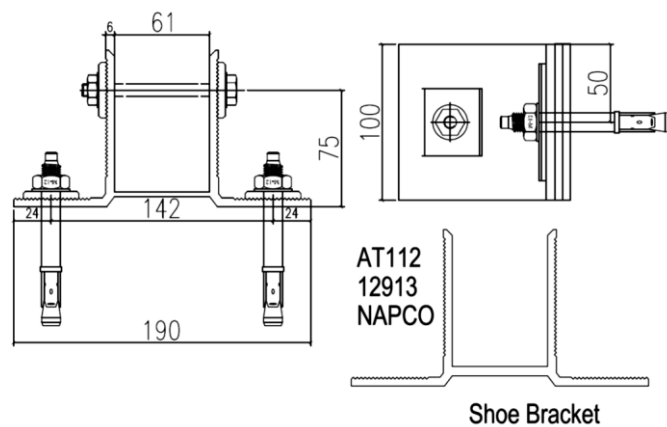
Technical drawing of a fabricated aluminum shoe bracket showing dimensions and bolt arrangement for mullion support
